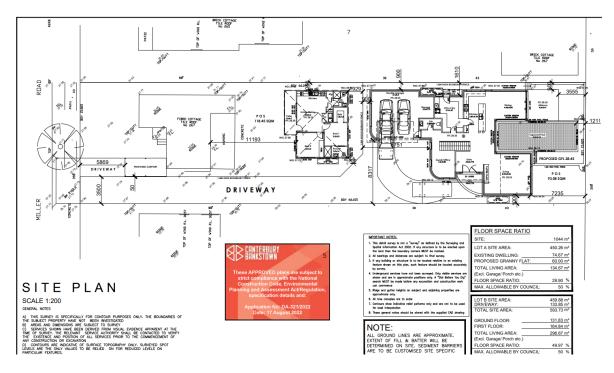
Extract of approved site plan with two storey dwelling house and swimming pool at rear (Source: Inkon Plans, 2021).
